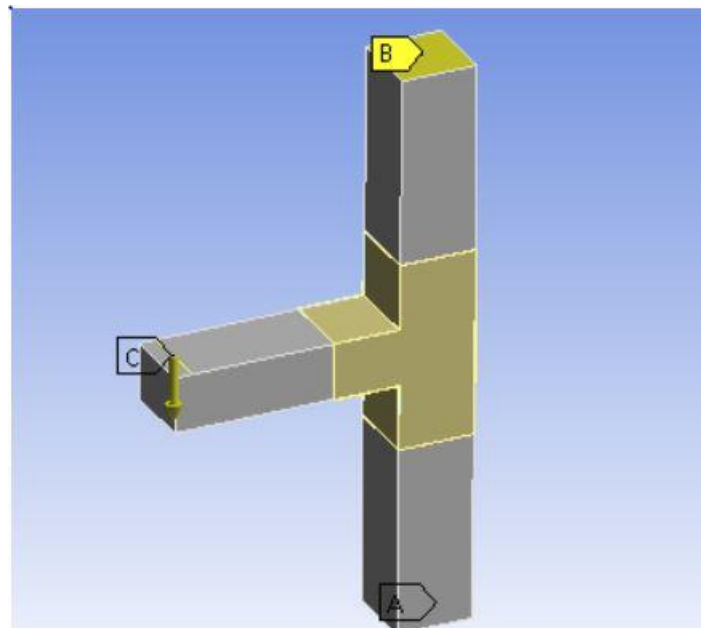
Model of exterior beam column joint retrofitted with hybrid FRP sheet
